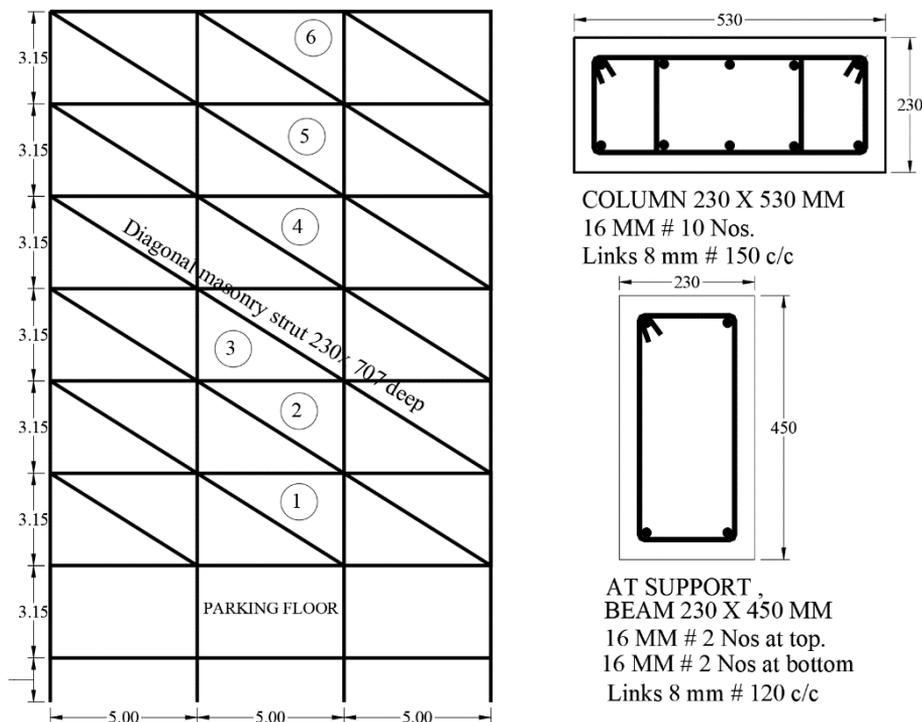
Details of as built structure (Same sections are used for assessment of subassembly in Fig.4)
